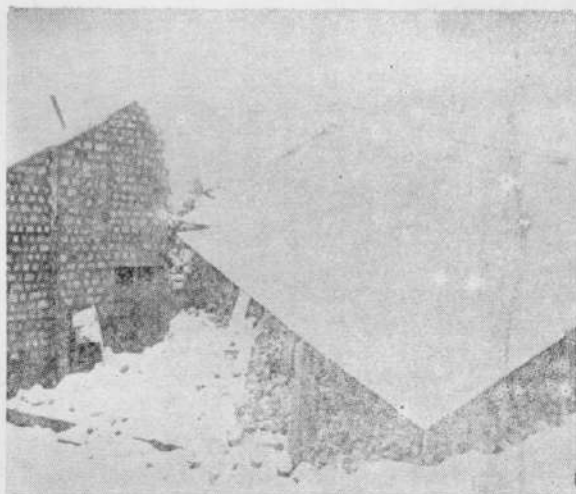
Collapse of stone masonry wall and roof in peon's hut at Chango village.
